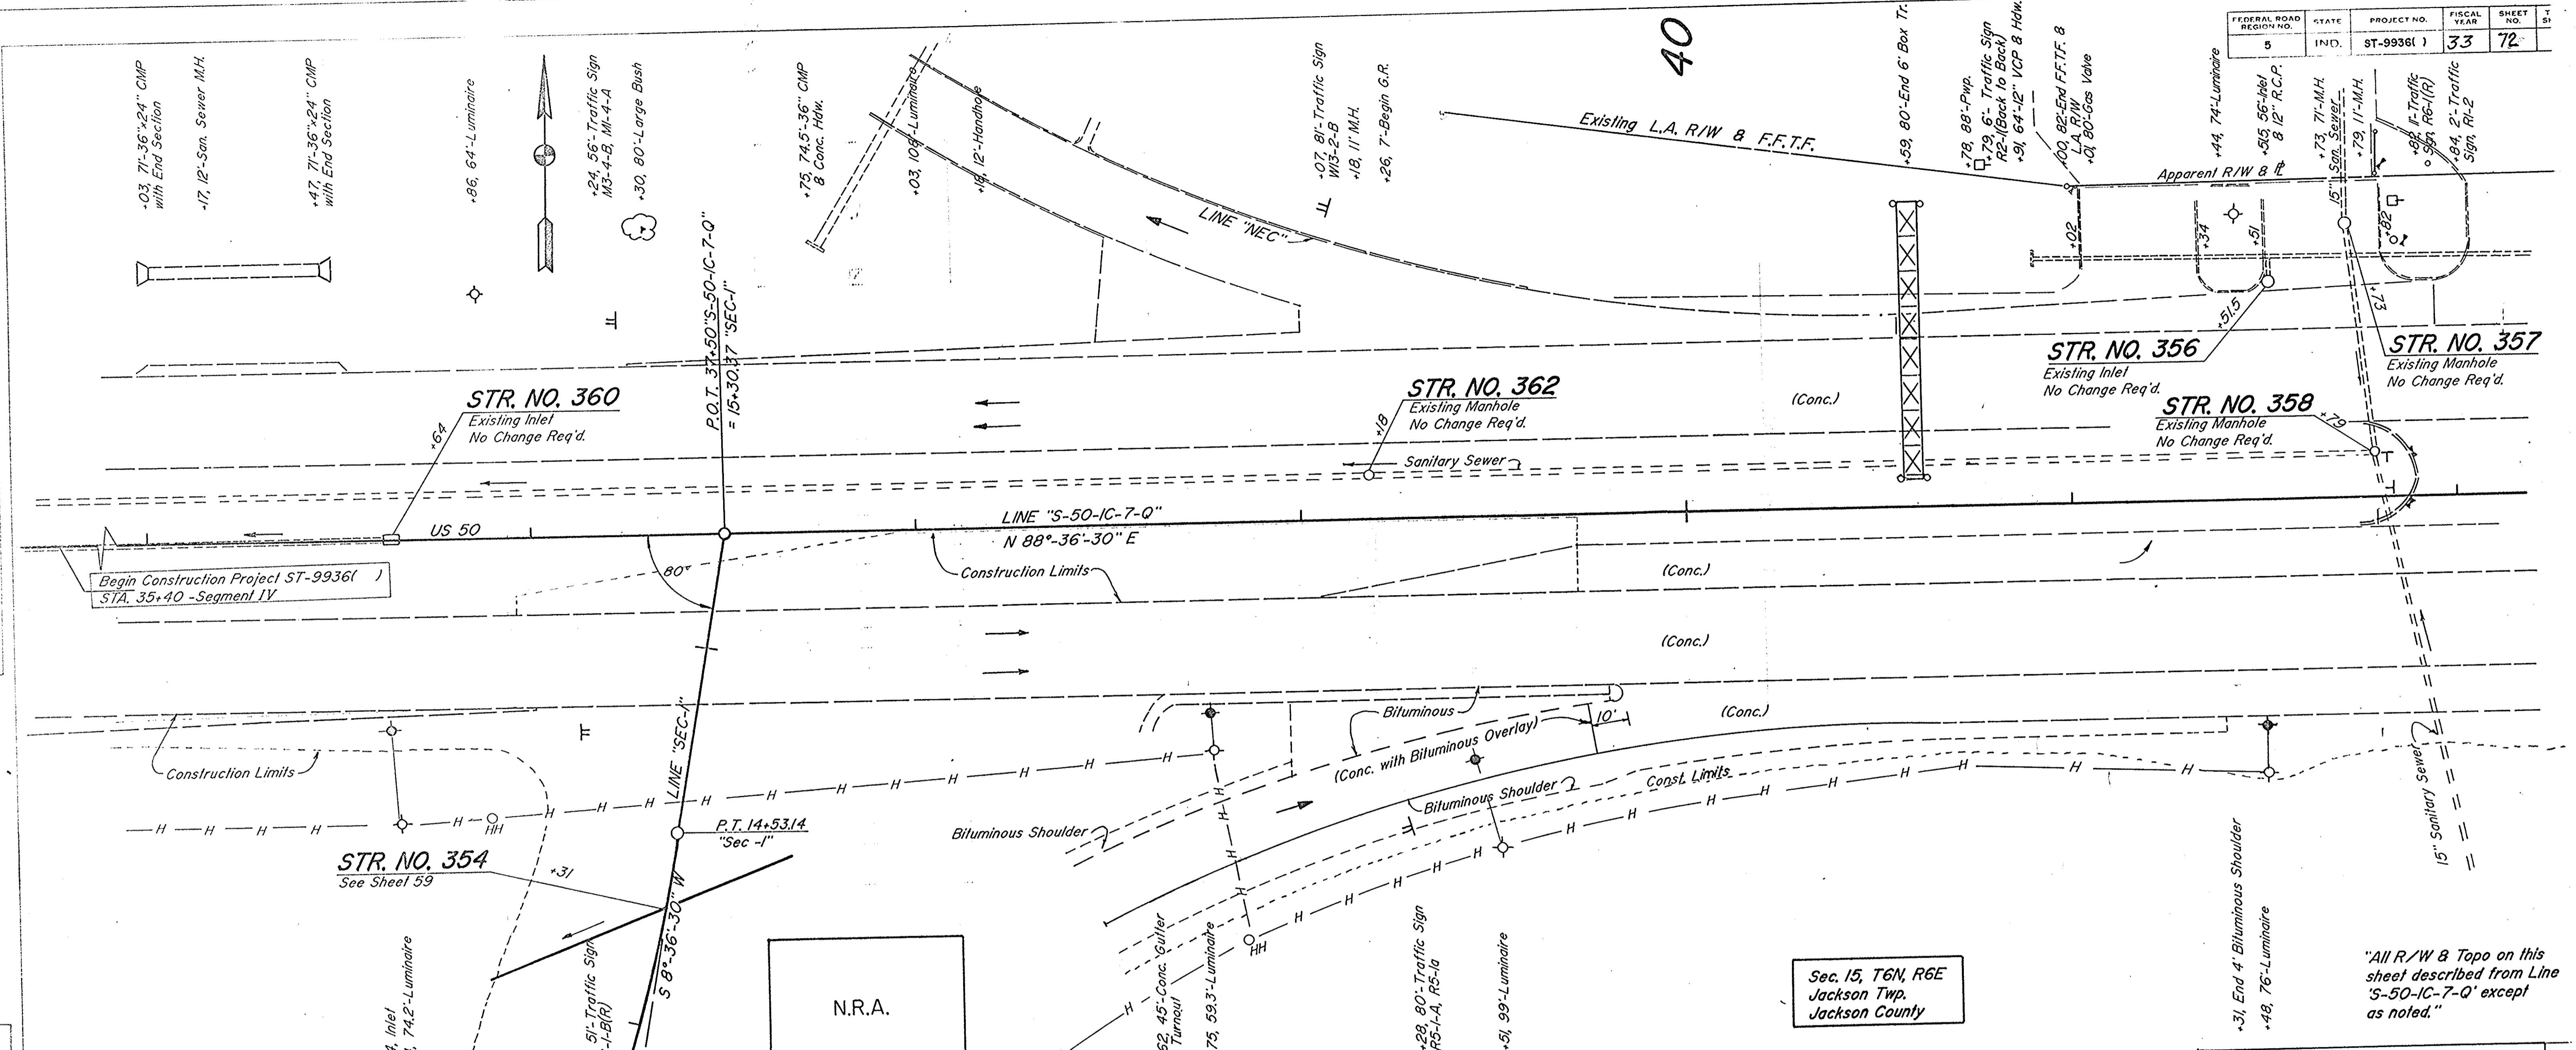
PLAN, PROFILE & R.R. STANDARD
